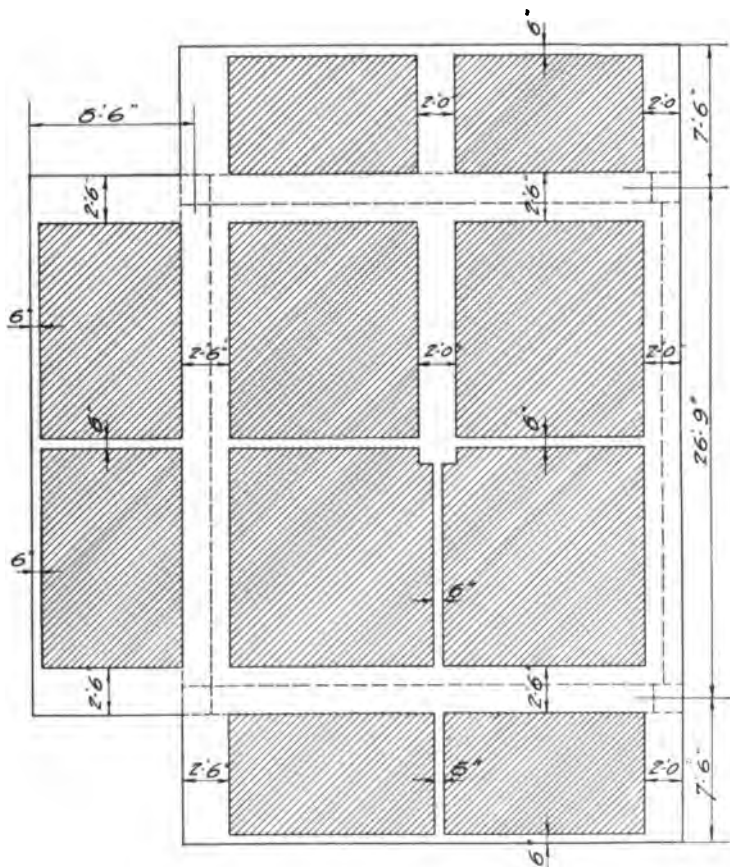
PLAN SHOWING METHOD OF LOADING BARR BUILDING TEST PANEL.
